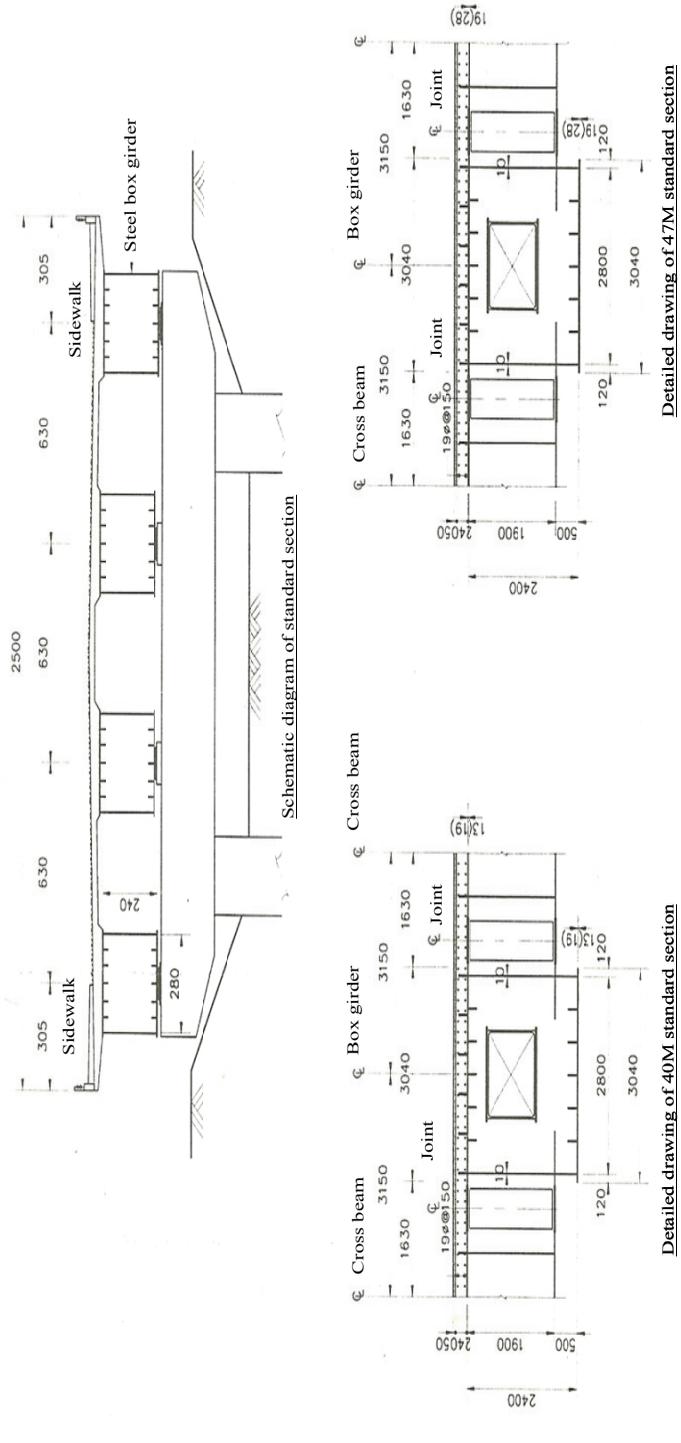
Steel beam section diagram of Wann-fwu bridge.
